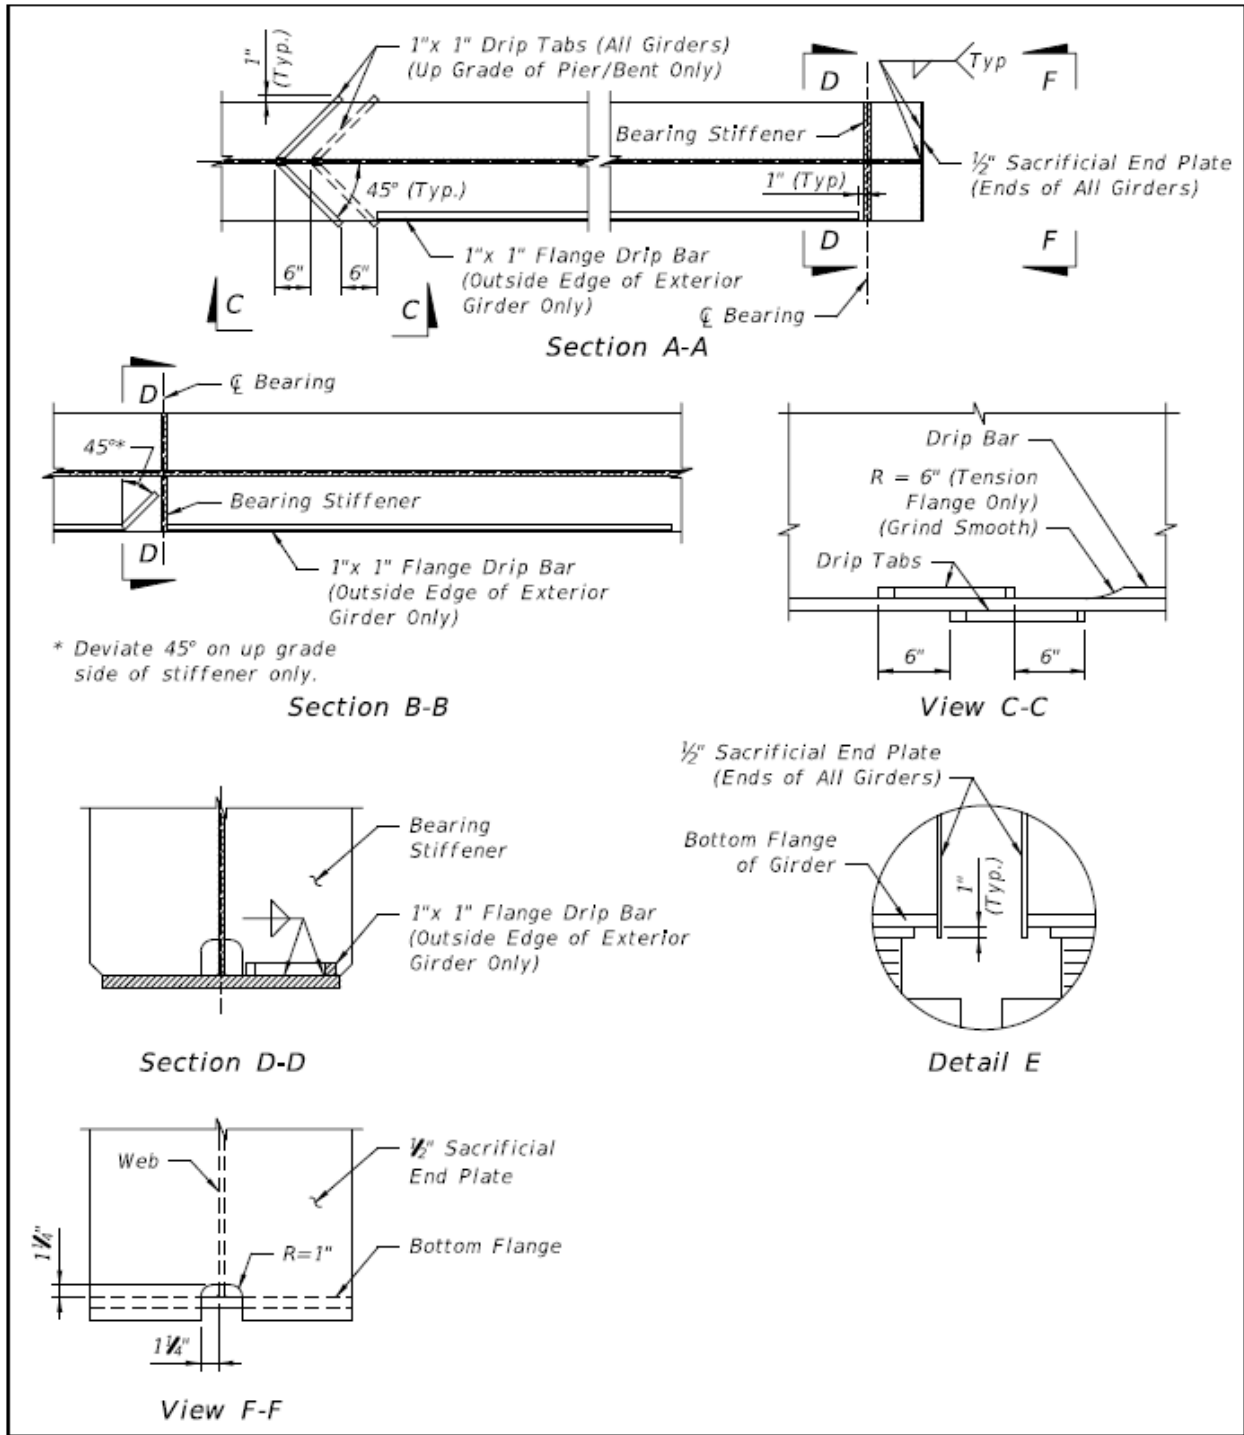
Weathering Steel I-Girder Details (2 of 2)
